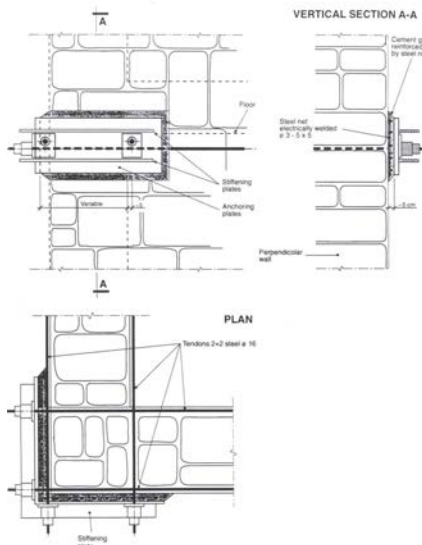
D: Seismic Strengthening : Wall-to-Floor Anchorage
